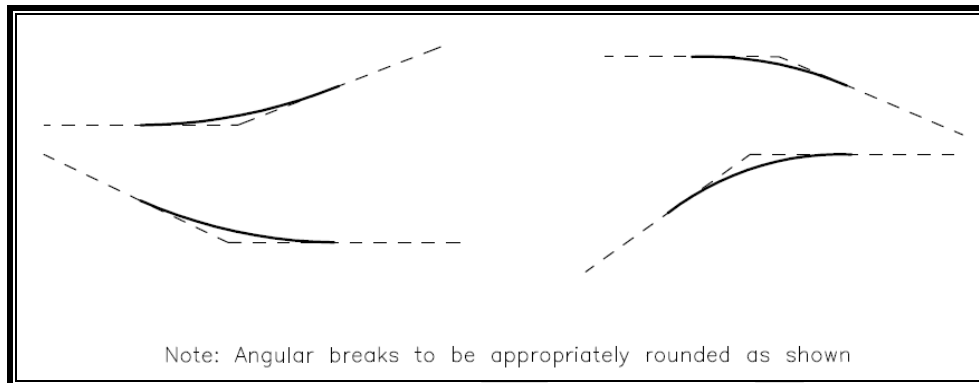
EANGULAR BREAKS IN DEVELOPMENT OF SUPERELEVATION ON DIVIDED ROADWAYS
